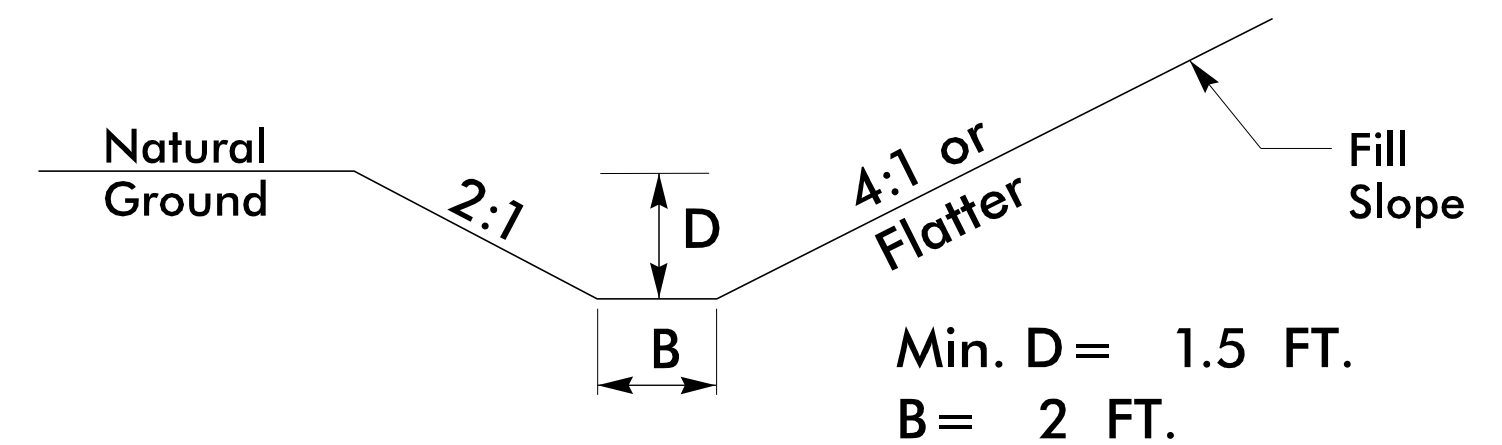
SPECIAL LATERAL 'V' DITCH (Not to Scale)
